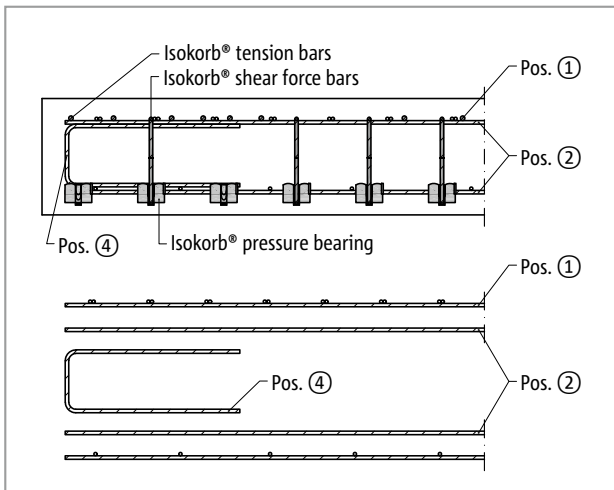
Schöck Isokorb® T type K-M1 to M11: On-site reinforcement on the balcony side in the Section A-A; Pos.4 = side reinforcement on the free edge perpendicular to the Schöck Isokorb®
